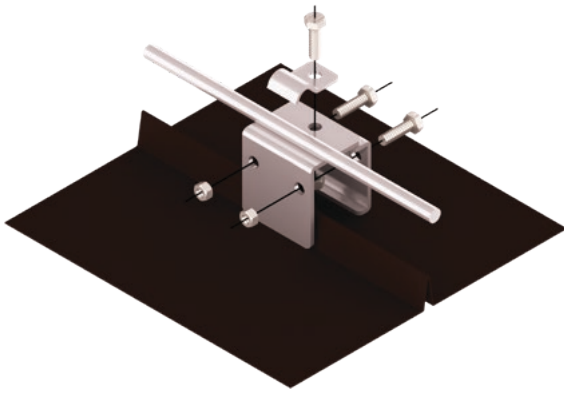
Installation of appropriate load-bearing elements on tin sheet roofing
